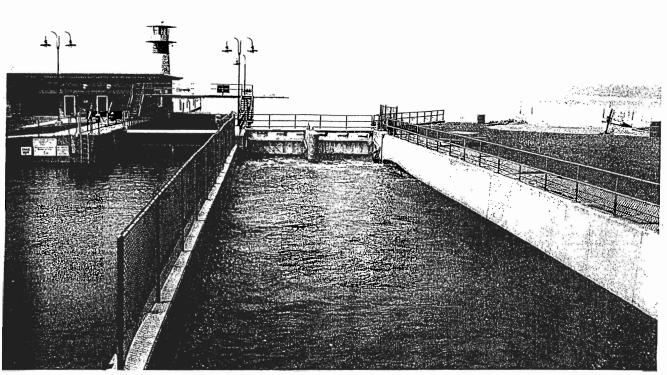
View of dam from downstream. Two tainter gates on right of wall and lock on left Photo 2 - View looking downstream from bridge over Sherman Avenue
